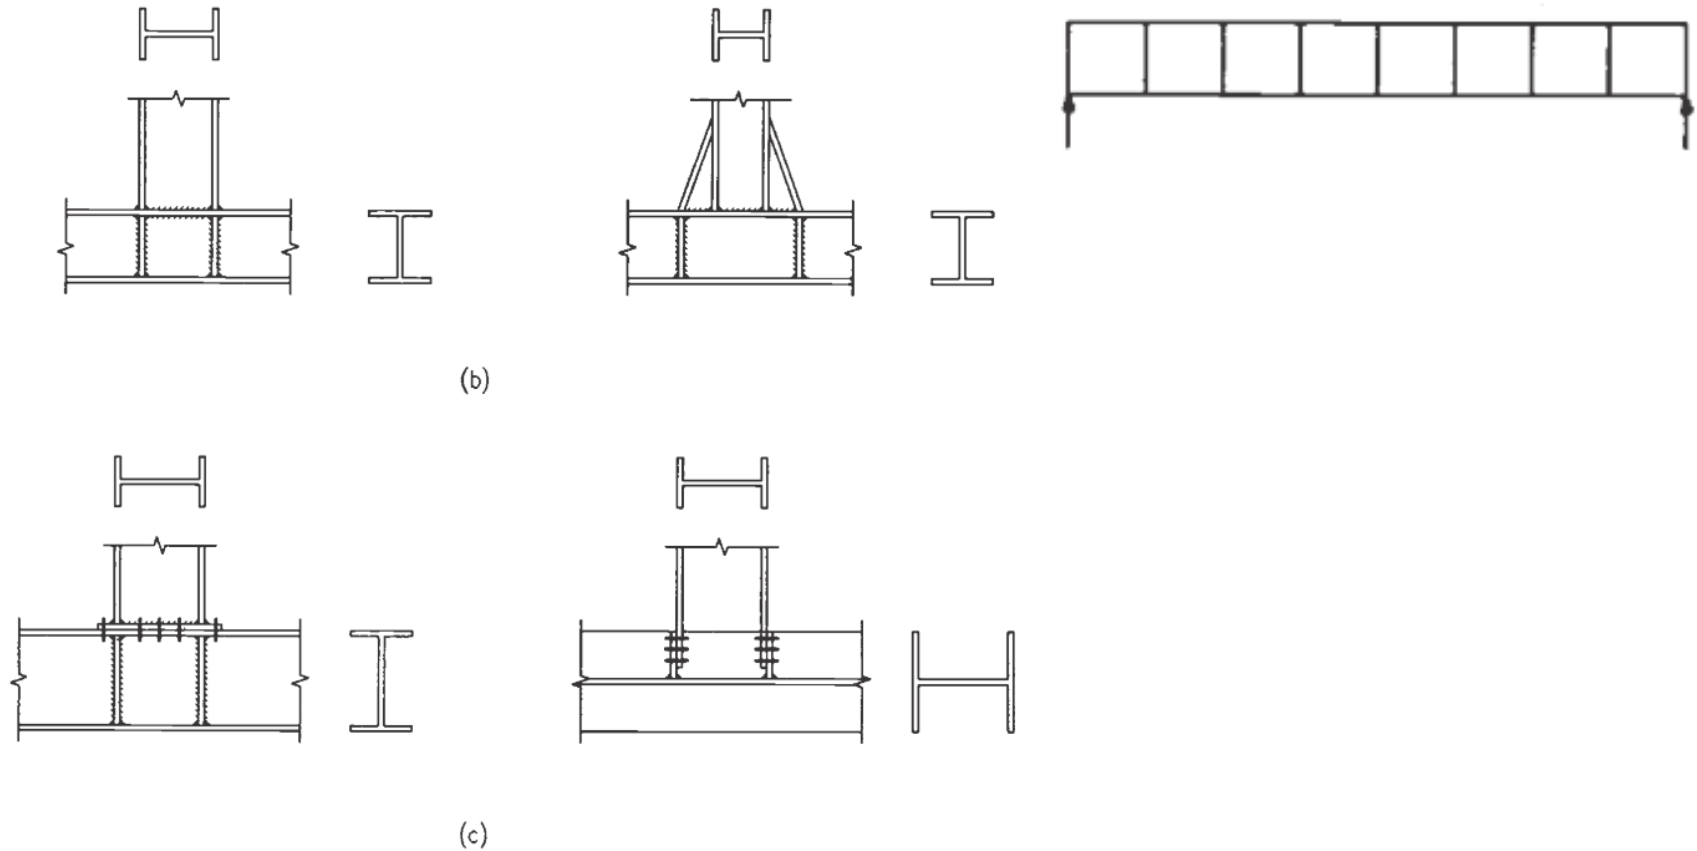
Typical details of Vierendeel girders: (a) typical forms, (b) welded connections, (c) bolted connections
